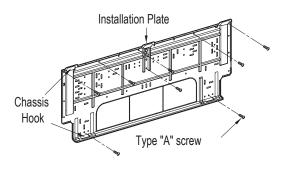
Standard Wall-Mounted (SV Frame) Installation Plates. Attaching Screw Placement.
